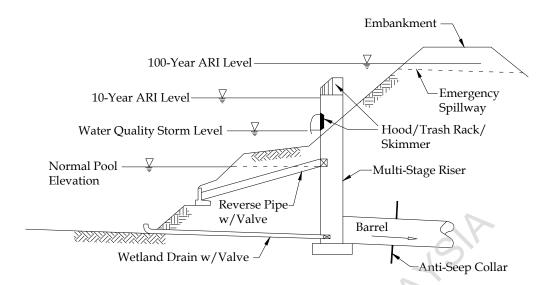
Typical Wetlands Facility Outlet Structure (Modified from MDE, 2000)
